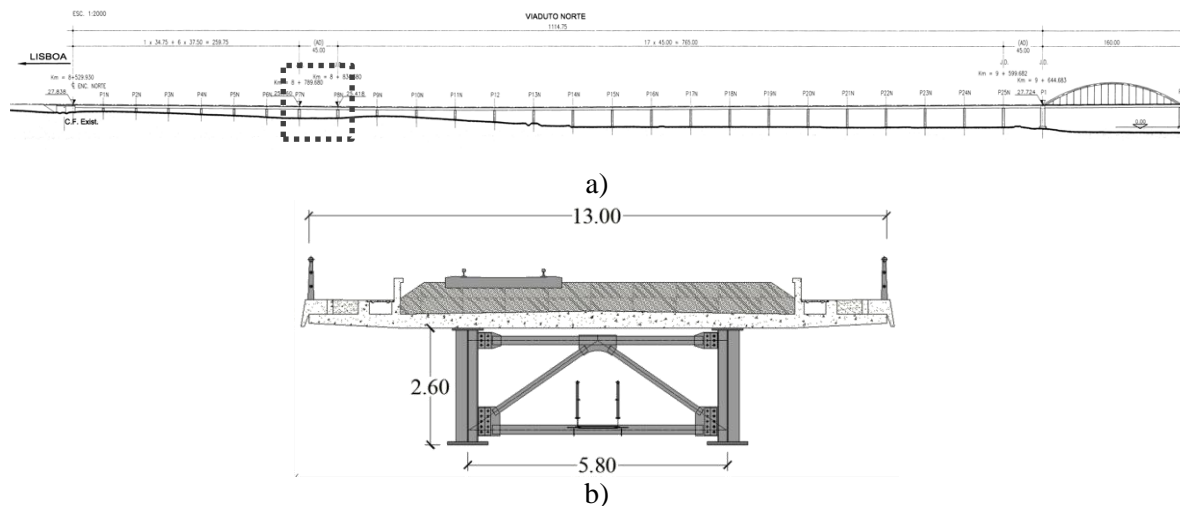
Alcácer do Sal bridge: a) elevation view of the north access viaduct; b) cross section
